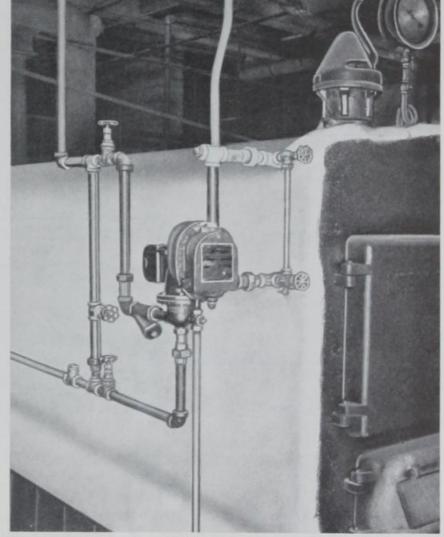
Webster Boiler Protector installed on low pressure, cast iron boiler.
